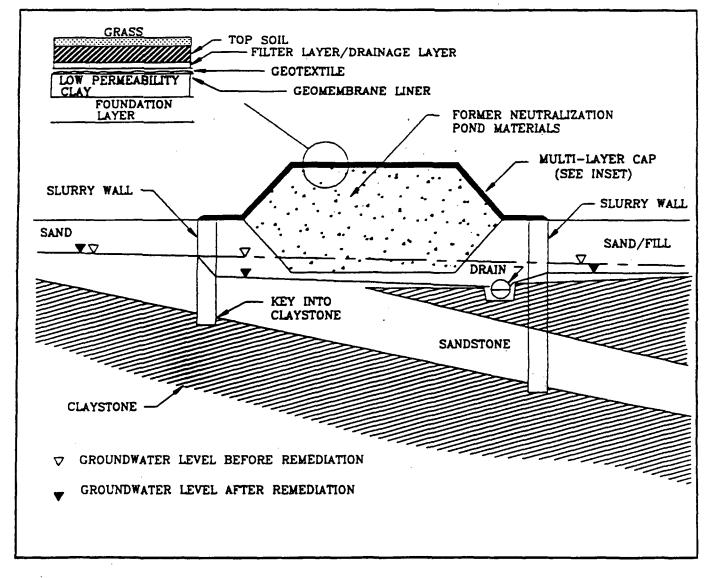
FORMER NEUTRALIZATION POND CROSS SECTION
